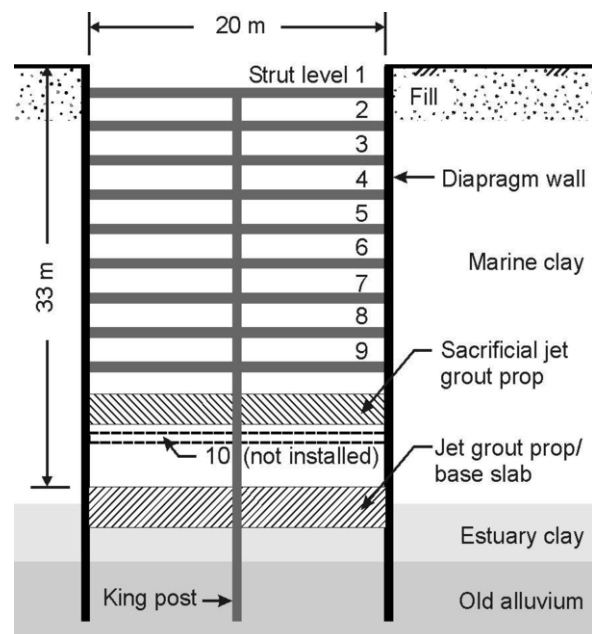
Typical cross section of the MRT excavation in Singapore that collapsed 20 April 2004.
